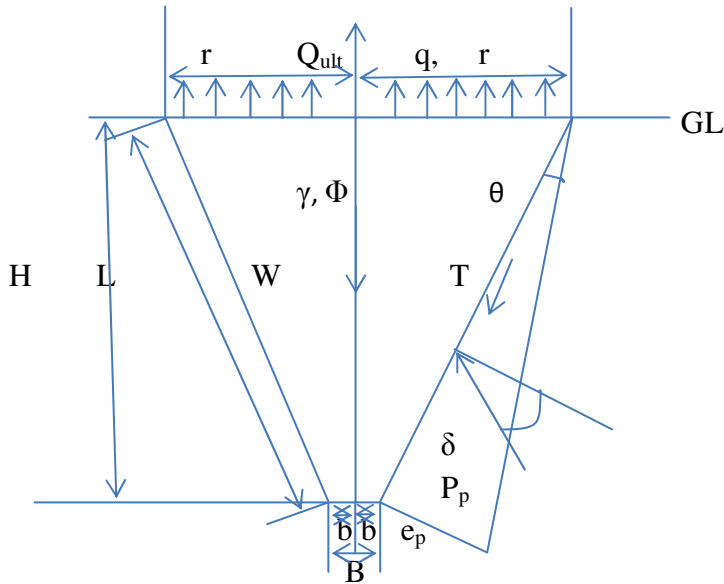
Forces acting on Assumed Failure Surface for Shallow Anchor
